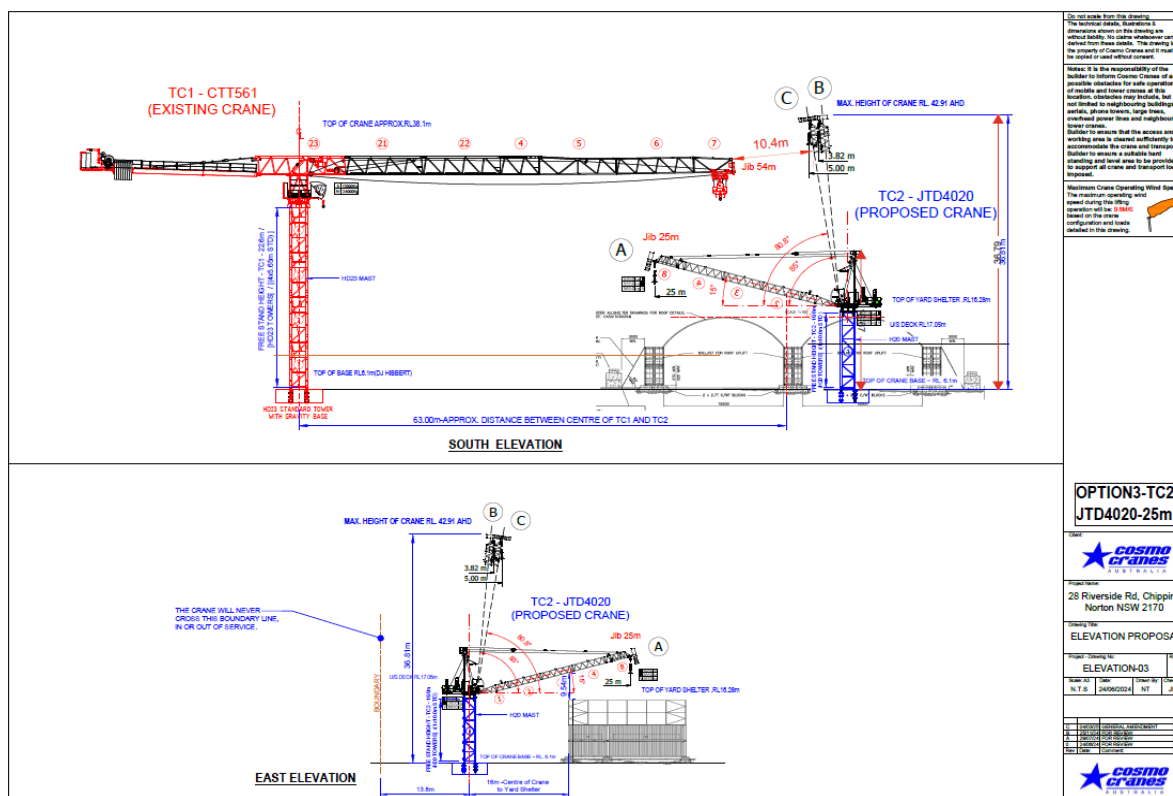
Proposed elevation of the proposed tower crane marked 'TC2' and the existing approved crane,
